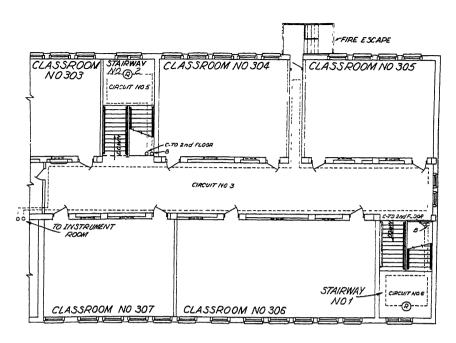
Cont. Third floor plan showing location of pneumatic tubing of rate-of-rise automatic fire detection system.
